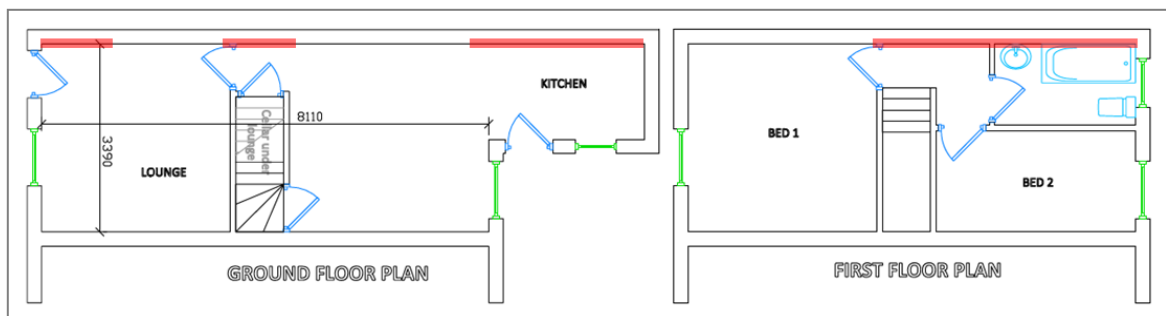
Ground and first floor plans with highlighted problem areas
